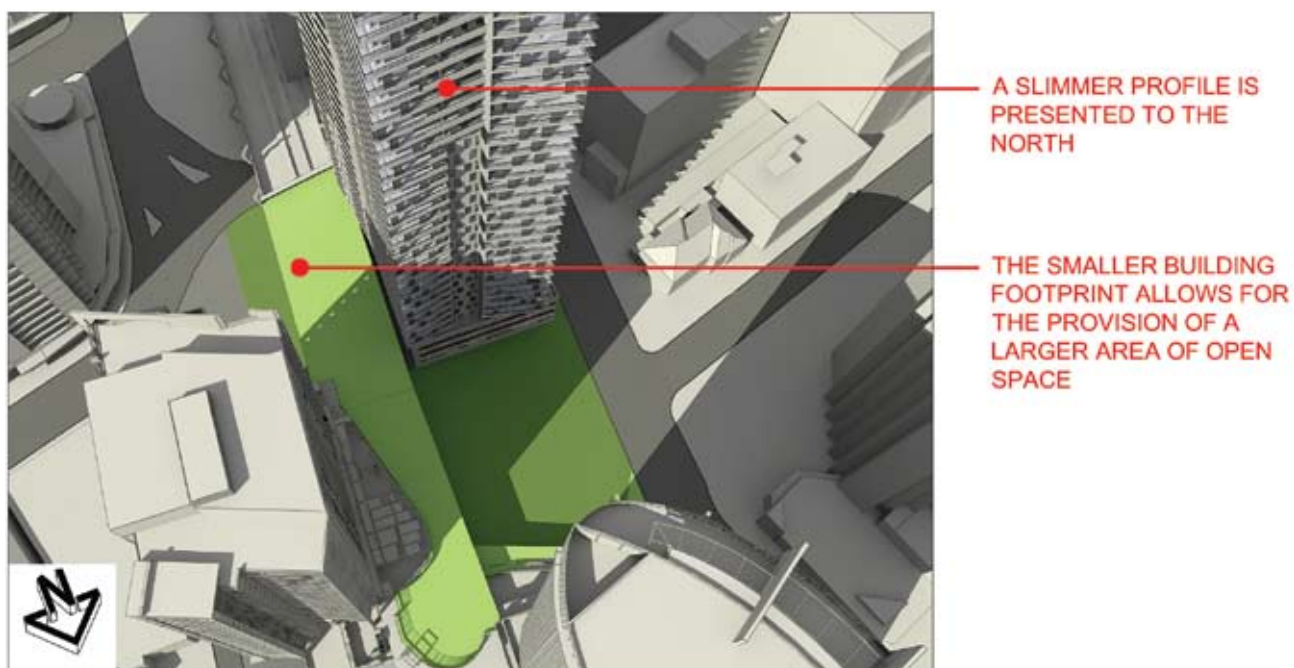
3D image of proposed residential building as viewed looking towards the south
